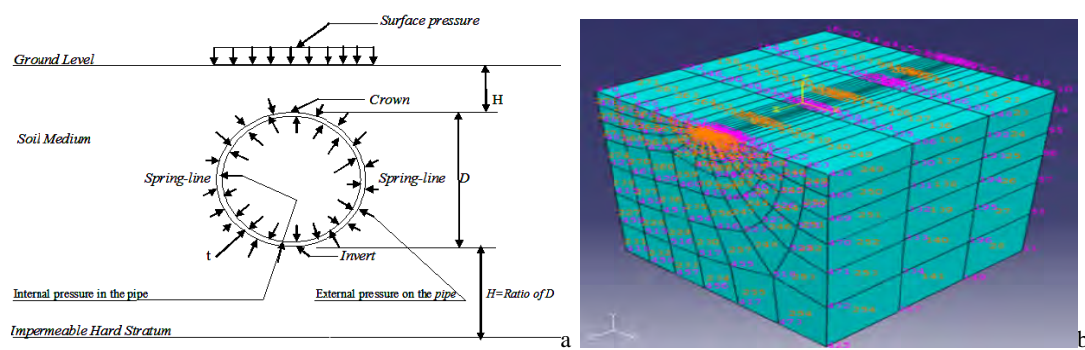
(a) Cross-section of underground pipe [23]; (b) Finite element model of soil medium, intervening medium and pipe [16]
